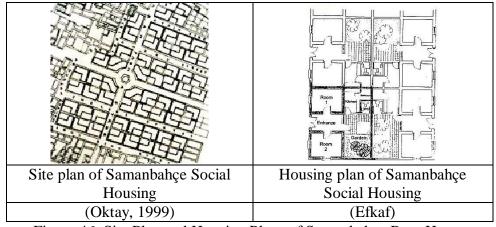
Site Plan and Housing Plans of Samanbahçe Row House
